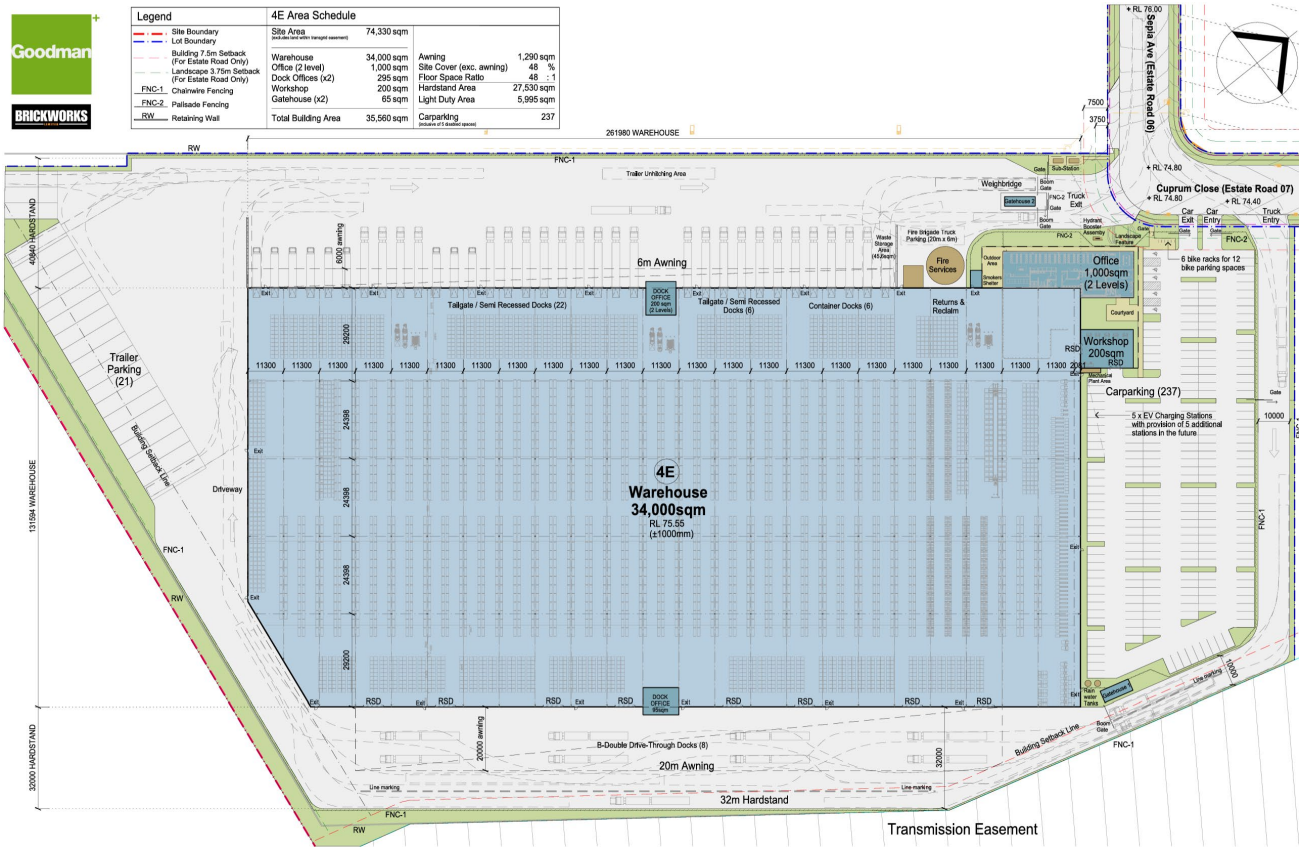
Oakdale West Estate, 4E site and Warehouse Plan
